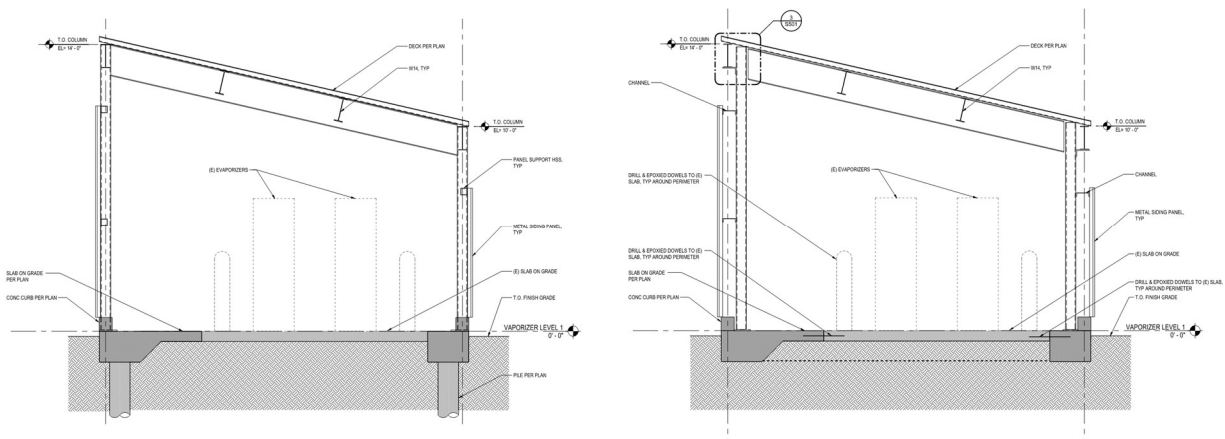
Vaporizer Canopy Foundation & Framing Options
